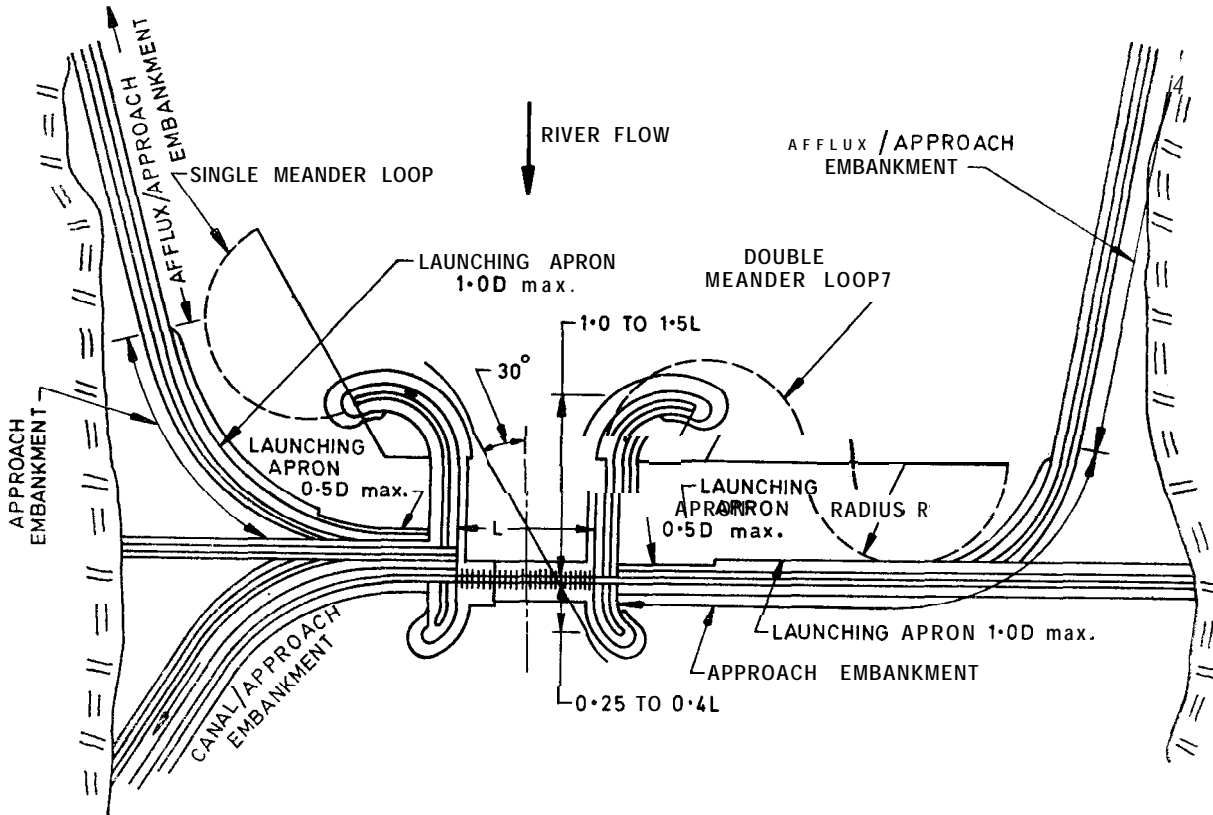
TYPICAL LAYOUT OF GUIDE BANK
